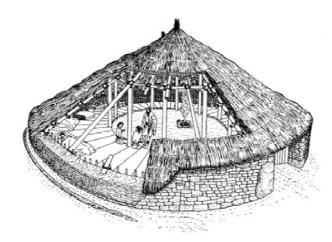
a possible roundhouse structure as suggested by ground plan figure 8. This sketch shows a maximum apex of 8 m equal to the plan radius, resulting in an outer wall height of 3 m. A lower apex of 6 m would require an outer wall height of 1 m. The total area is c.200 sq m and the central area is 50 sq m. This structural suggests there was ample scope for an upper floor where there would be 1-3 m headroom in the central 4 m diameter (12.5 sq m) floor space.
